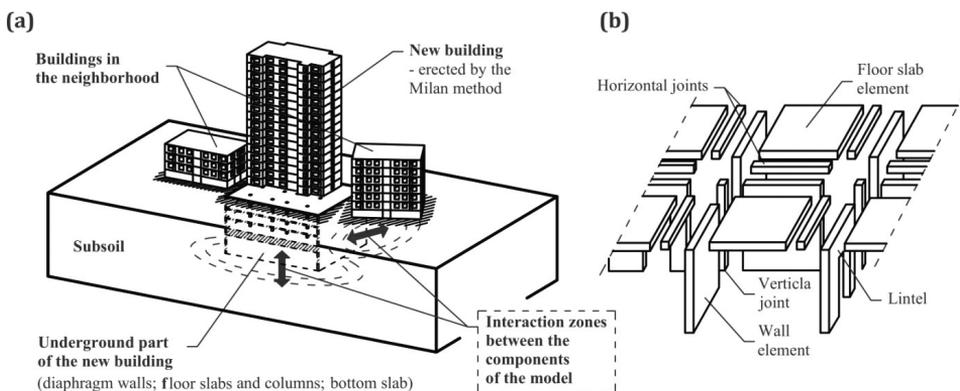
Components of the interactive and “tracking” model of deeply set buildings together with existing buildings in the neighborhood: a) 3D model view; b) subdivision of the building structure into constitutive elements
